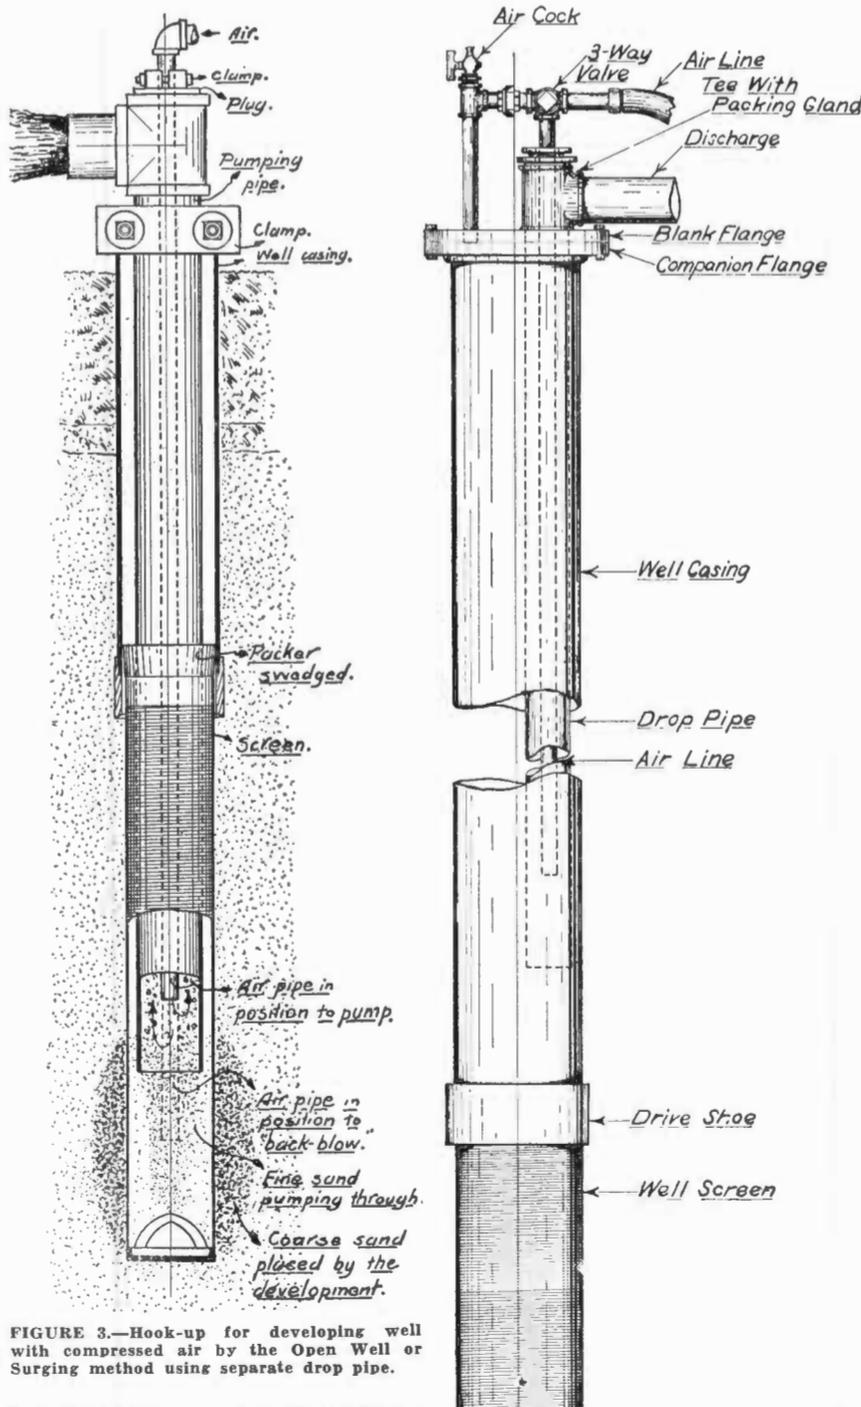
Hook-up for developing well with compressed air by the Open Well or Surging method using separate drop pipe.
